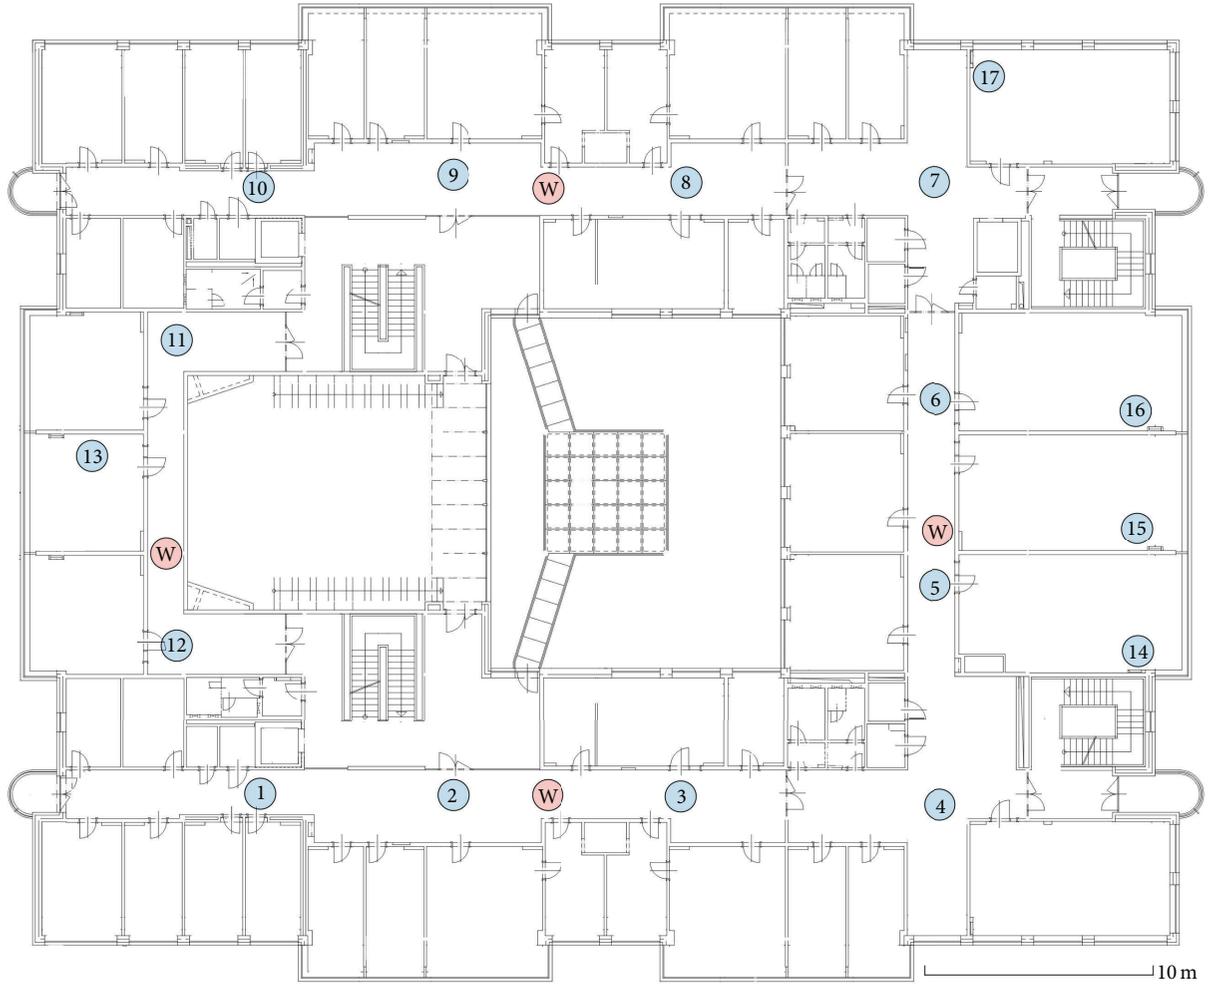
Floor plan with WiFi access points and BLE beacons.
